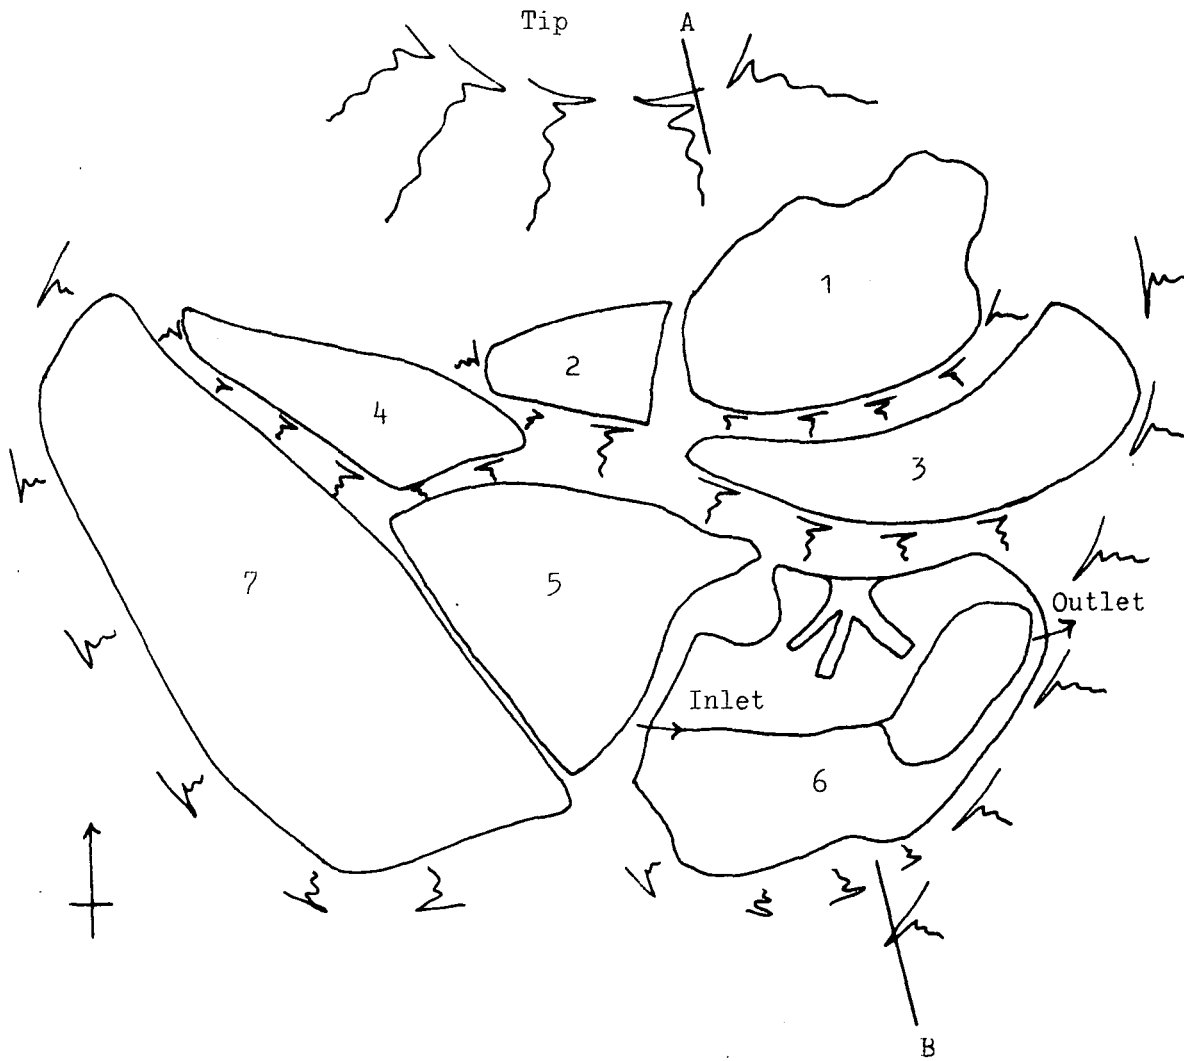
Cross section of the tip and lagoons at Maltby.
